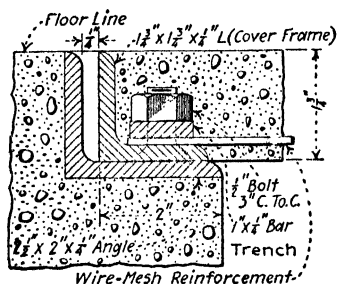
Detail of reinforced concrete trench cover and curb angle.
